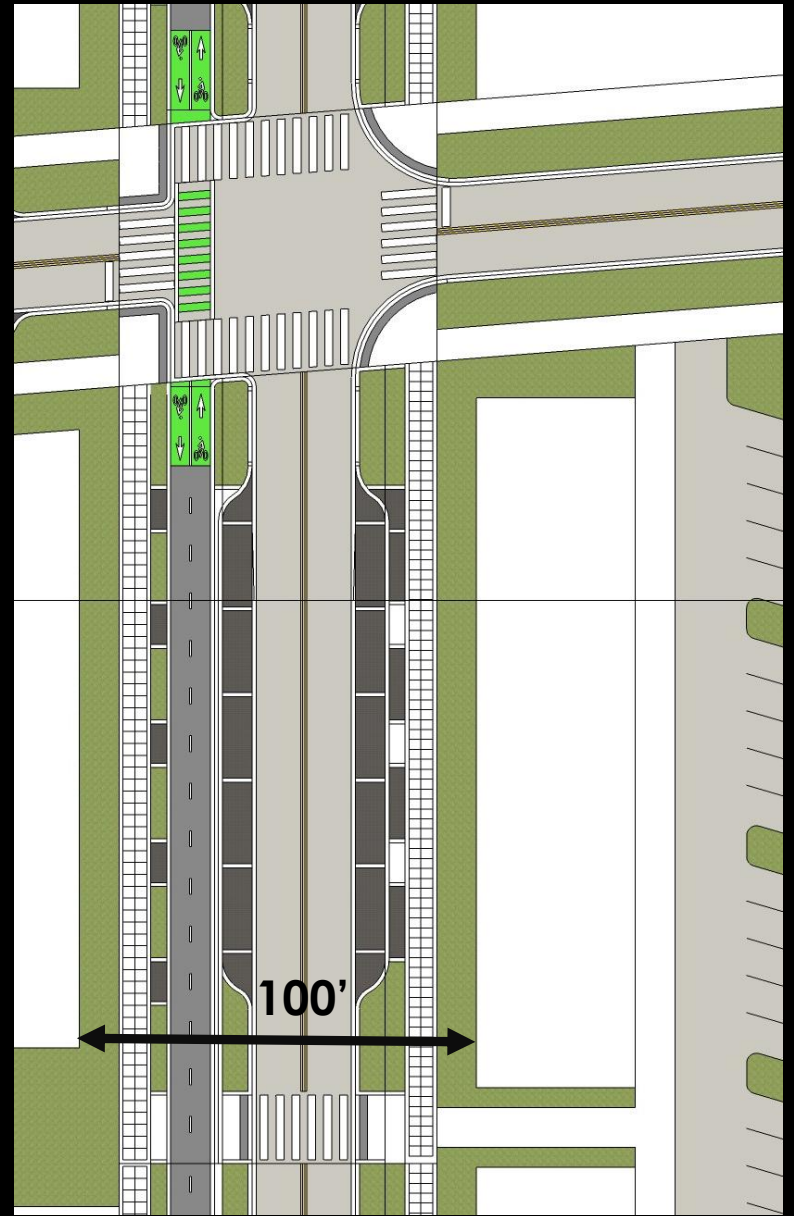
CONCEPTUAL STREET SECTION - 17TH AVENUE (SOUTH OF LRT STATION)
